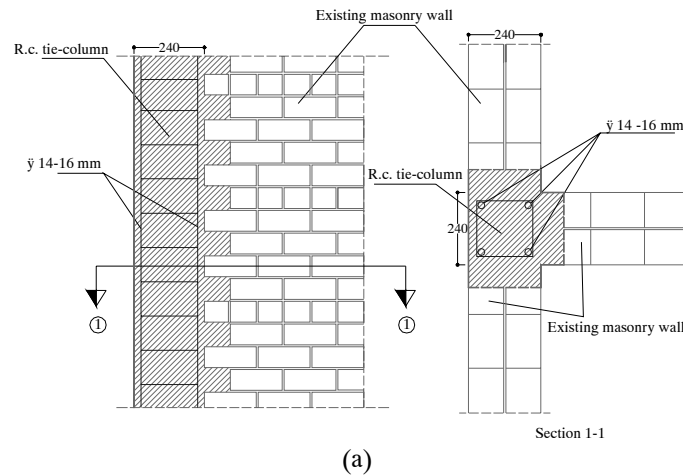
Placement of new tie-columns in a brick-masonry wall
